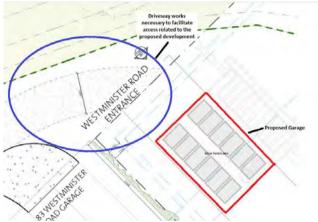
Extract of plan showing proposed garage is red and location of works associated with driveway.
